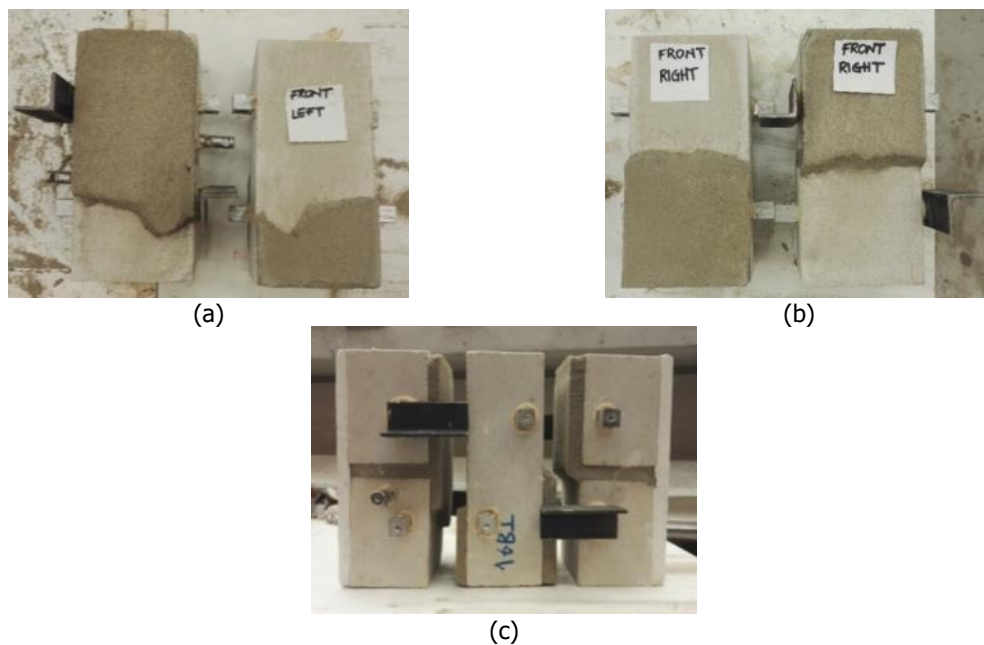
Crack pattern of modified triplets under shear test: (a) front-left joint; (b) front-right joint; (c) front view.
